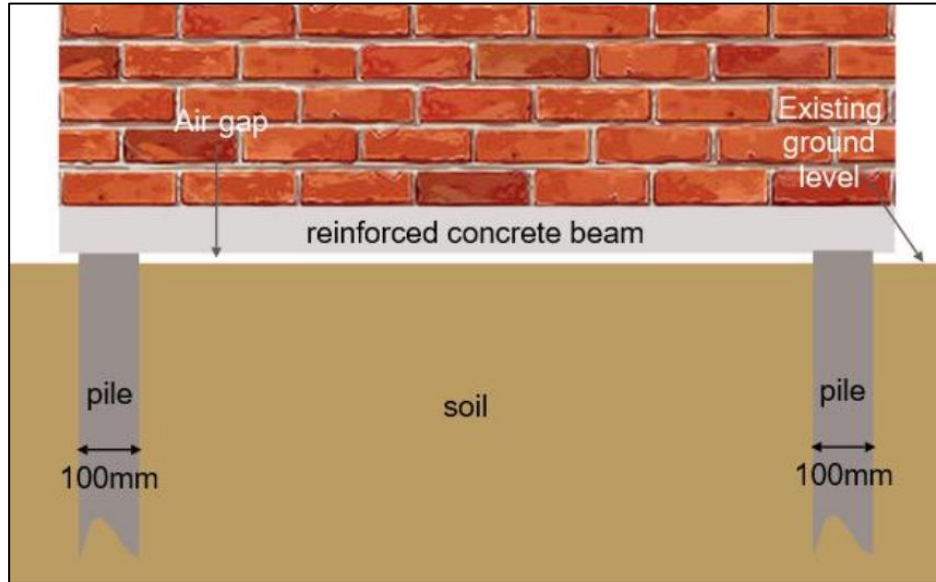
Illustrative diagram showing pile-and-beam foundation construction.
